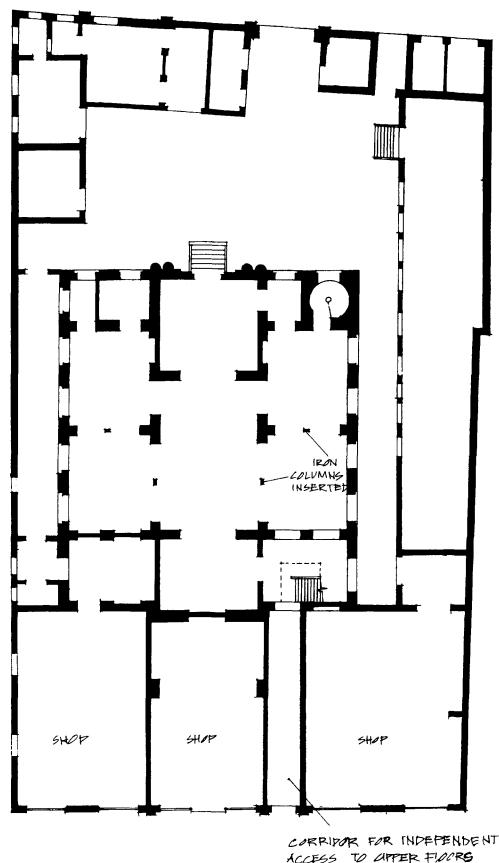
House on 23/24 Waterloo Street, ground floor plan showing second set of changes
